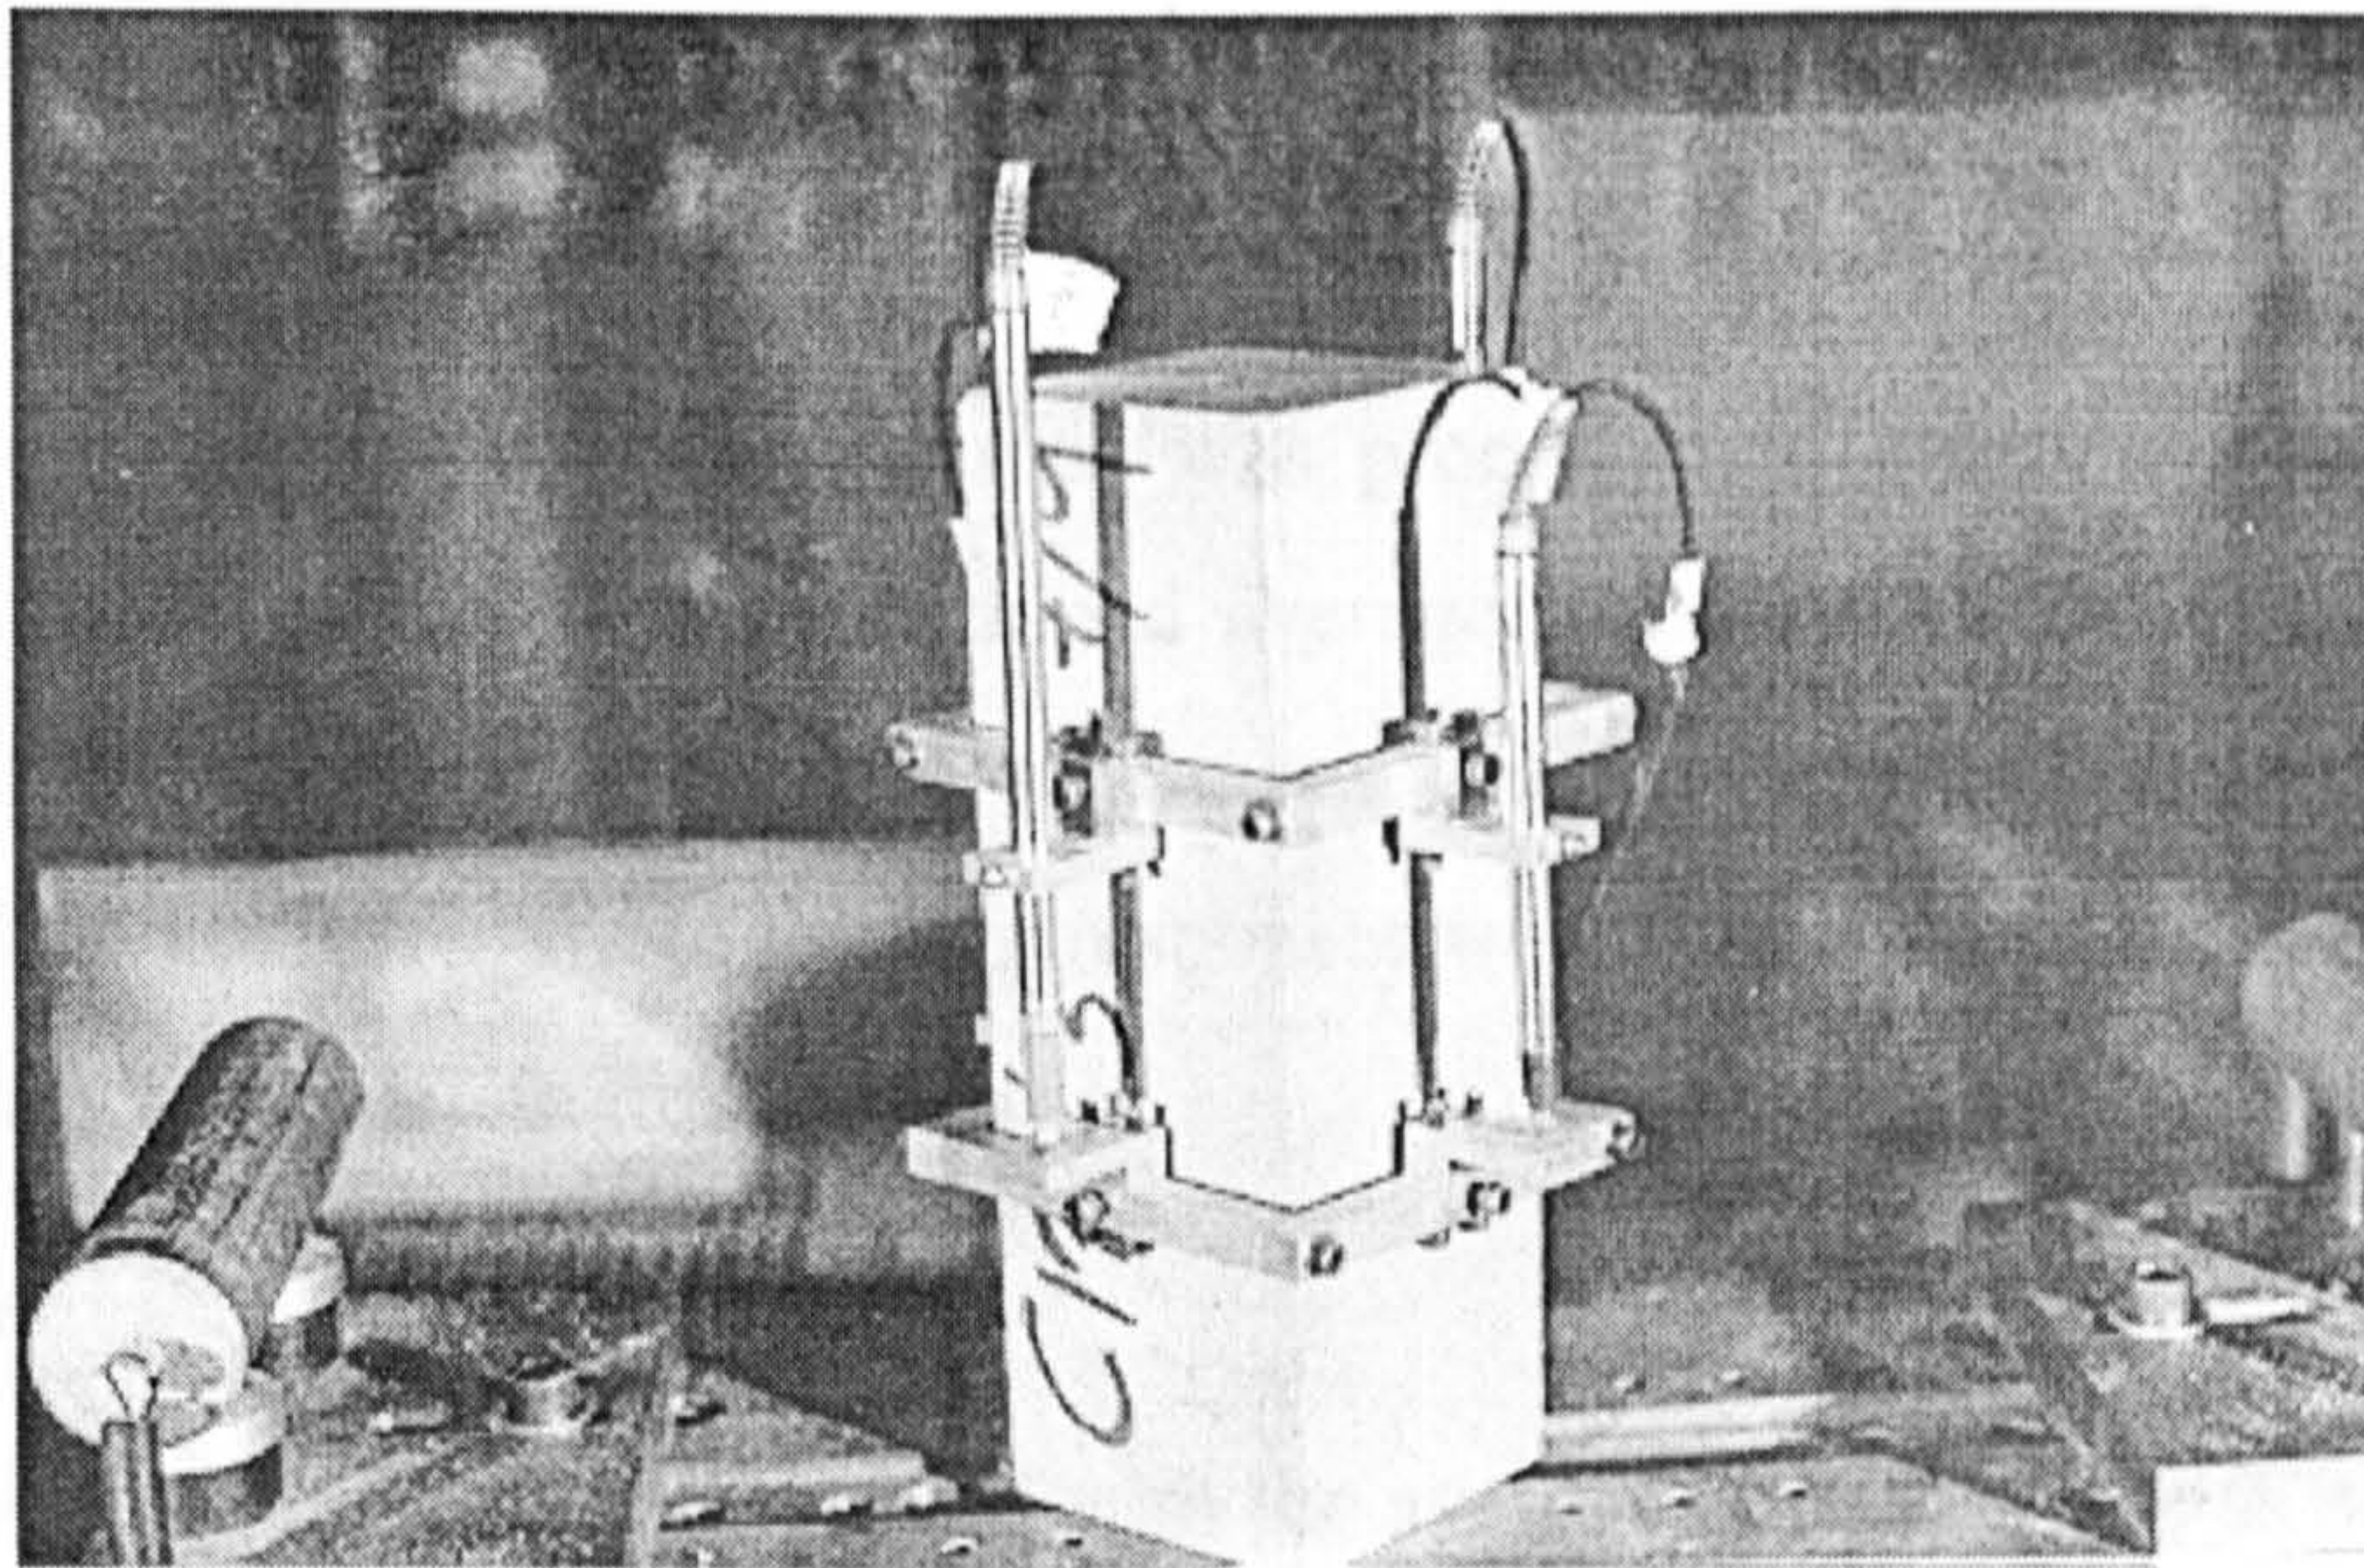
Compression specimen showing the LVDT mounting frame.
